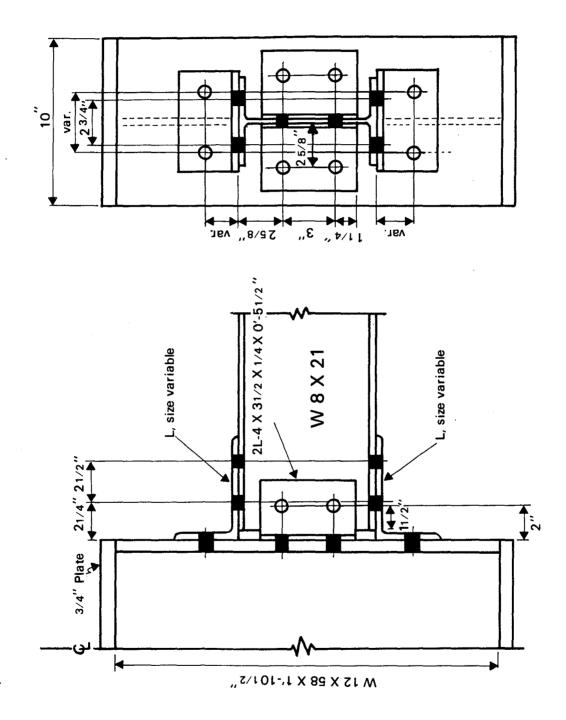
DETAILS OF CONNECTION FOR W8X21 BEAM - BOLTED SPECIMENS
